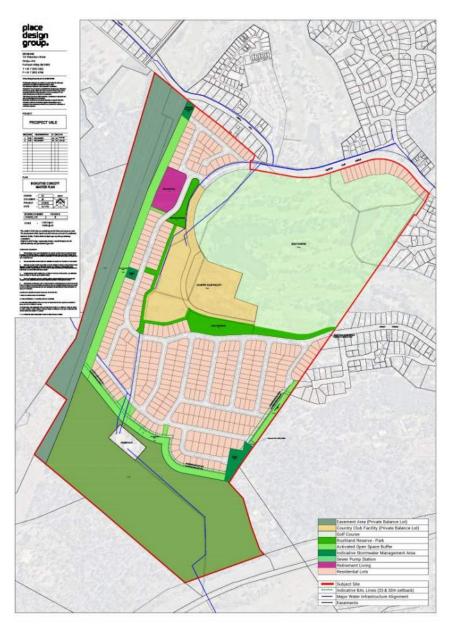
Subdivision Layout (Revision-3; Taken from Place Design Group)
